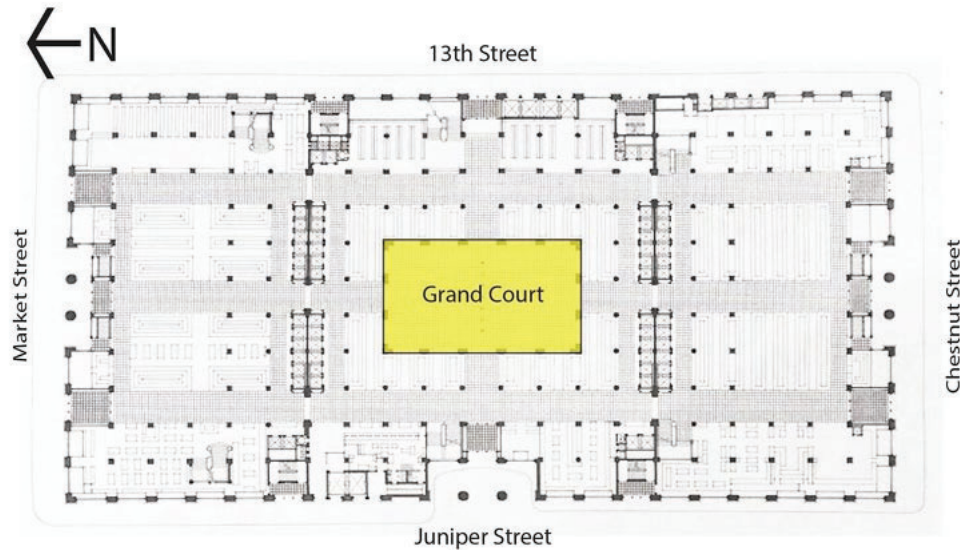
Plan of ground floor showing designated interior area in yellow. The Historical Commission has no jurisdiction over interior work outside the yellow area.
